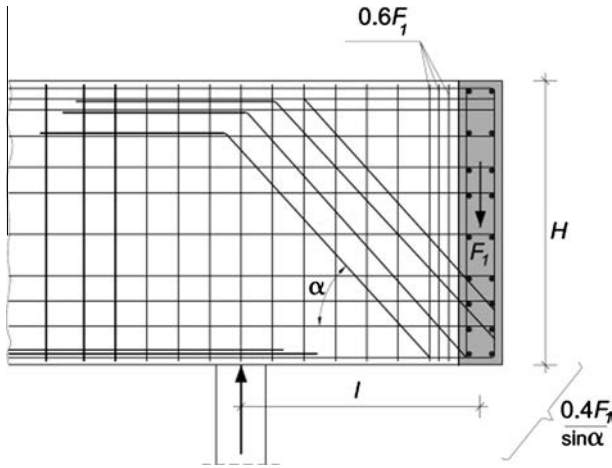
Reinforcement of a cantilever deep beam according to Leonhardt [14].
